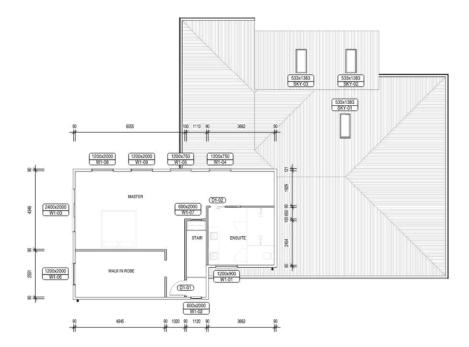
Excerpt from submitted proposed upper floor plan (Source: Formation Design & Drafting).
